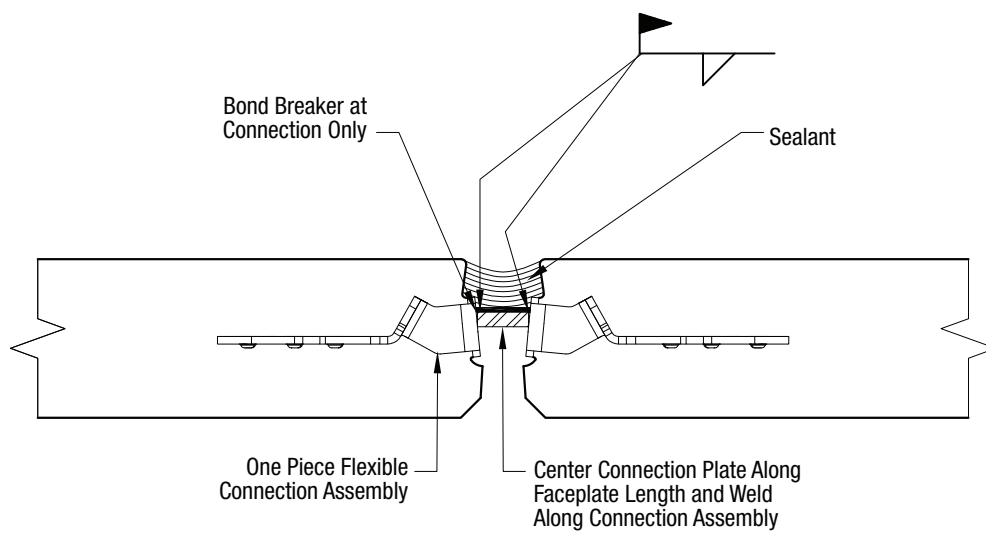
Alternate Flange-to-Flange Welded Connections
